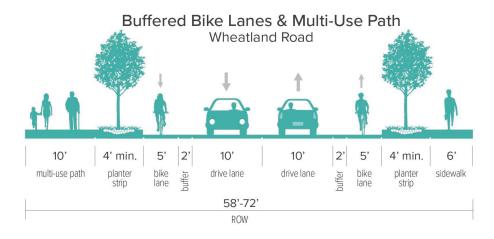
RECOMMENDED DESIGN ALTERNATIVE CROSS SECTION
